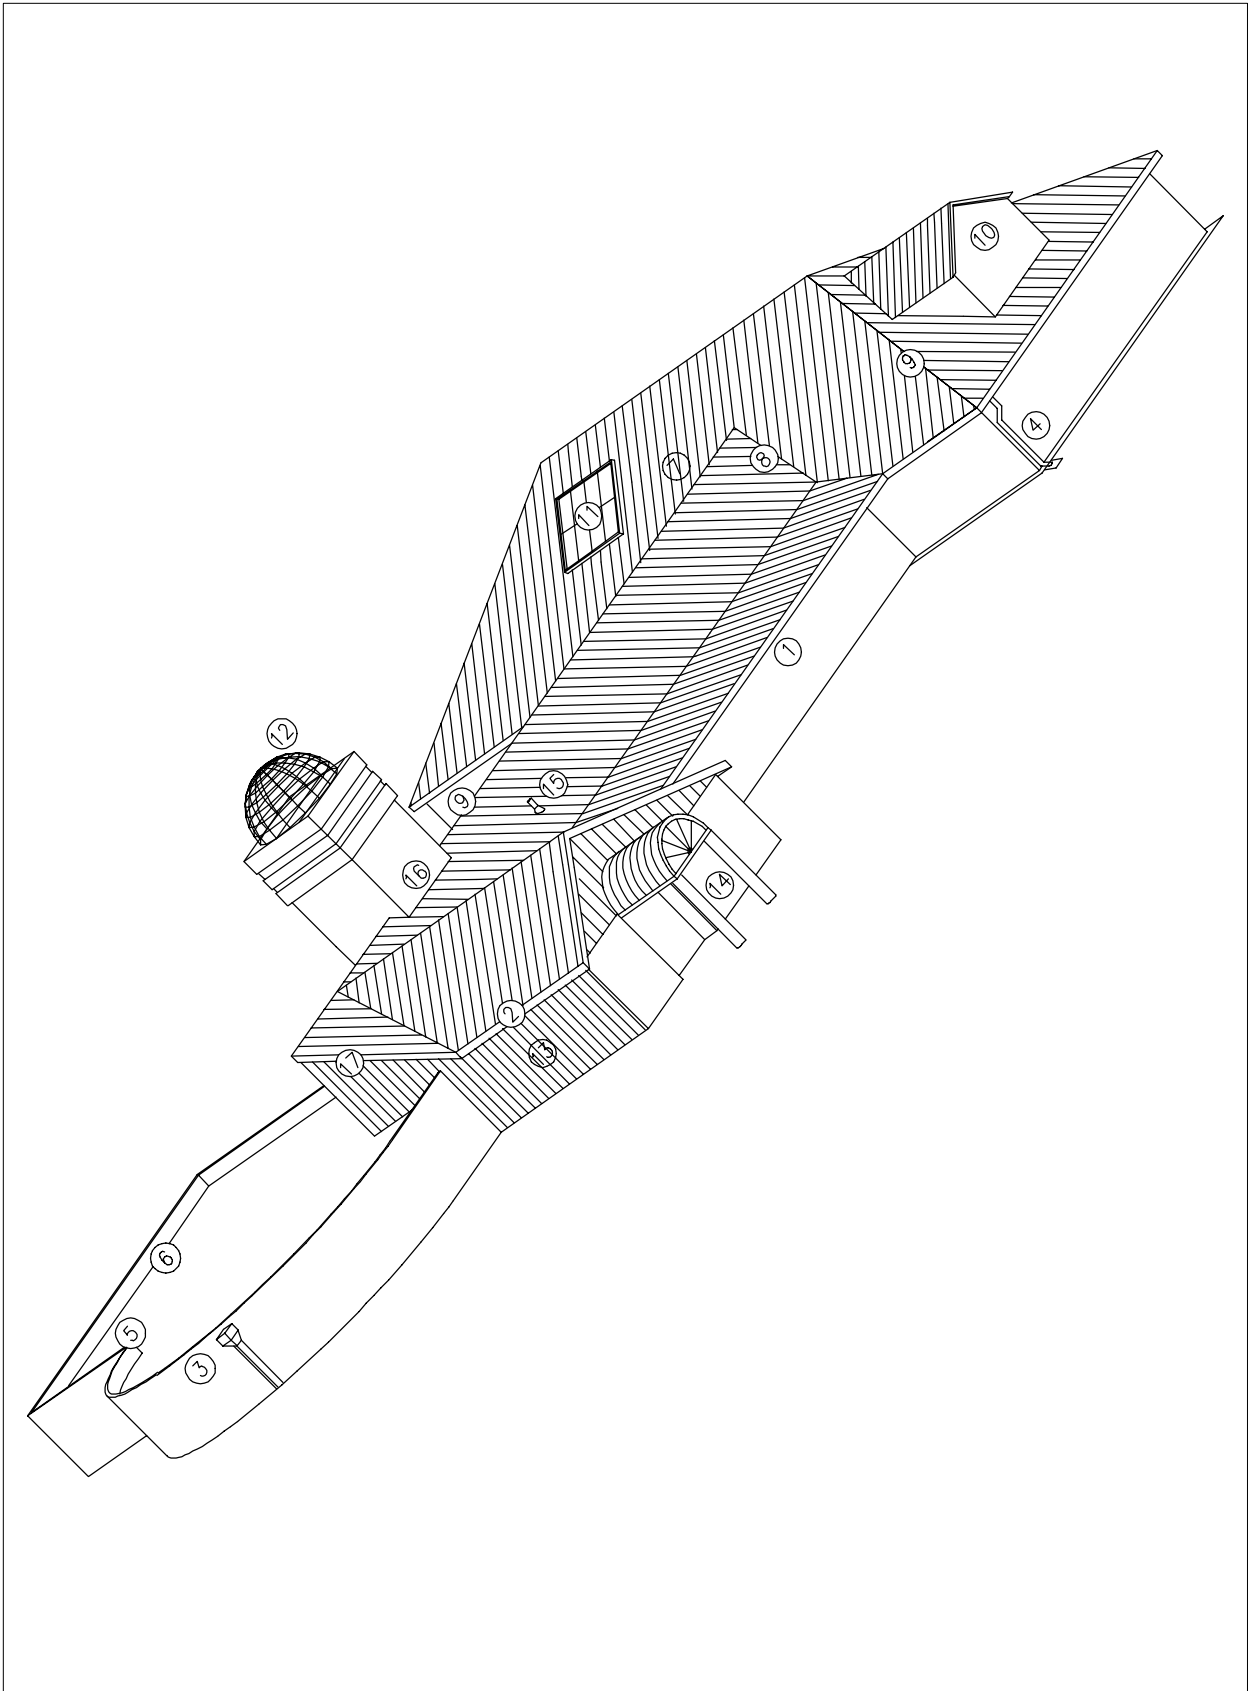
TYPICAL METAL ROOF PLAN
